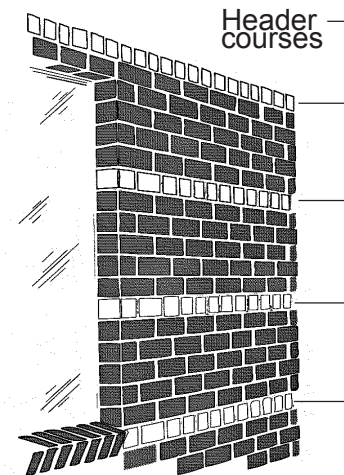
Header courses. Header courses of bricks are usually placed endwise every six or so rows in unreinforced masonry walls to tie the outer layer of bricks to the layers inside the wall.
